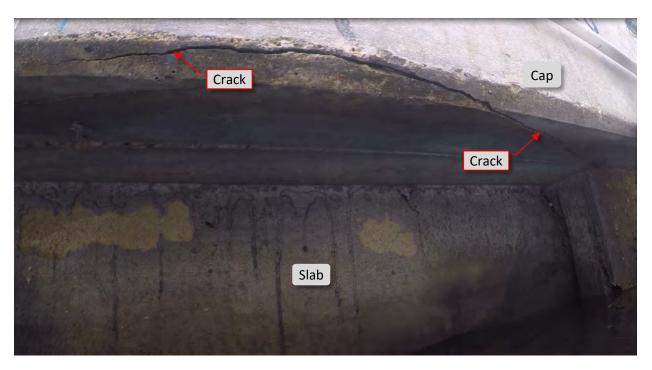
C3. STA 4+95 - 5+00. Crack at cap's bottom face and edge.
